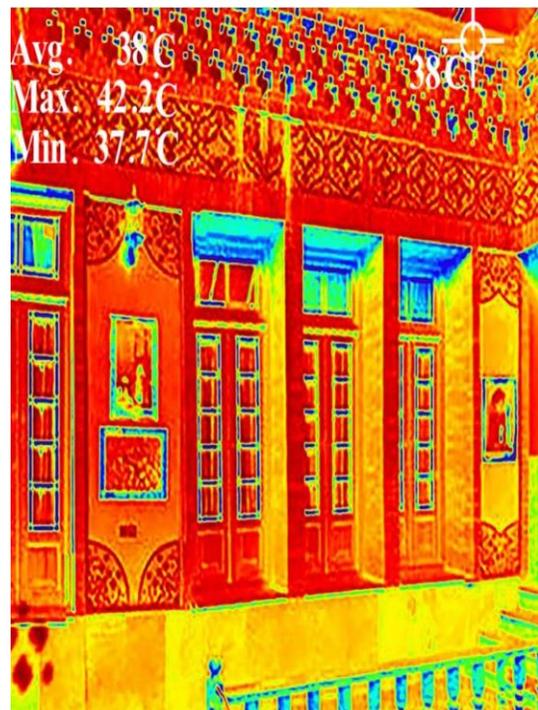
heat recording in a part of the building's roof in the closest distance to the garden pit
